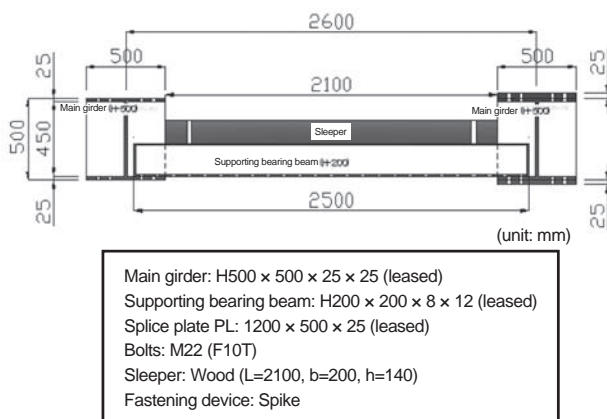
Specimen for Full-scale Loading Test (cross section)
